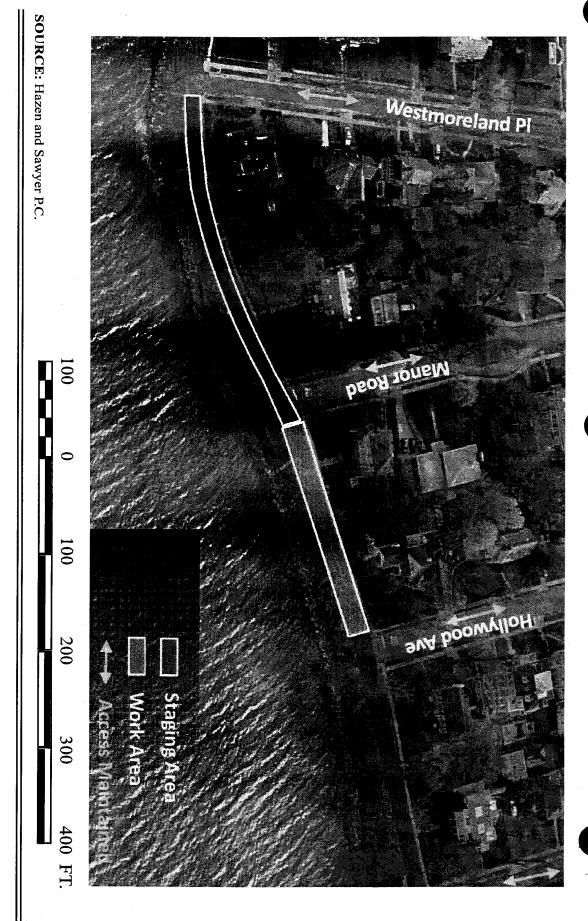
Current Aerial Photo, Collapse 2: Manor Road
